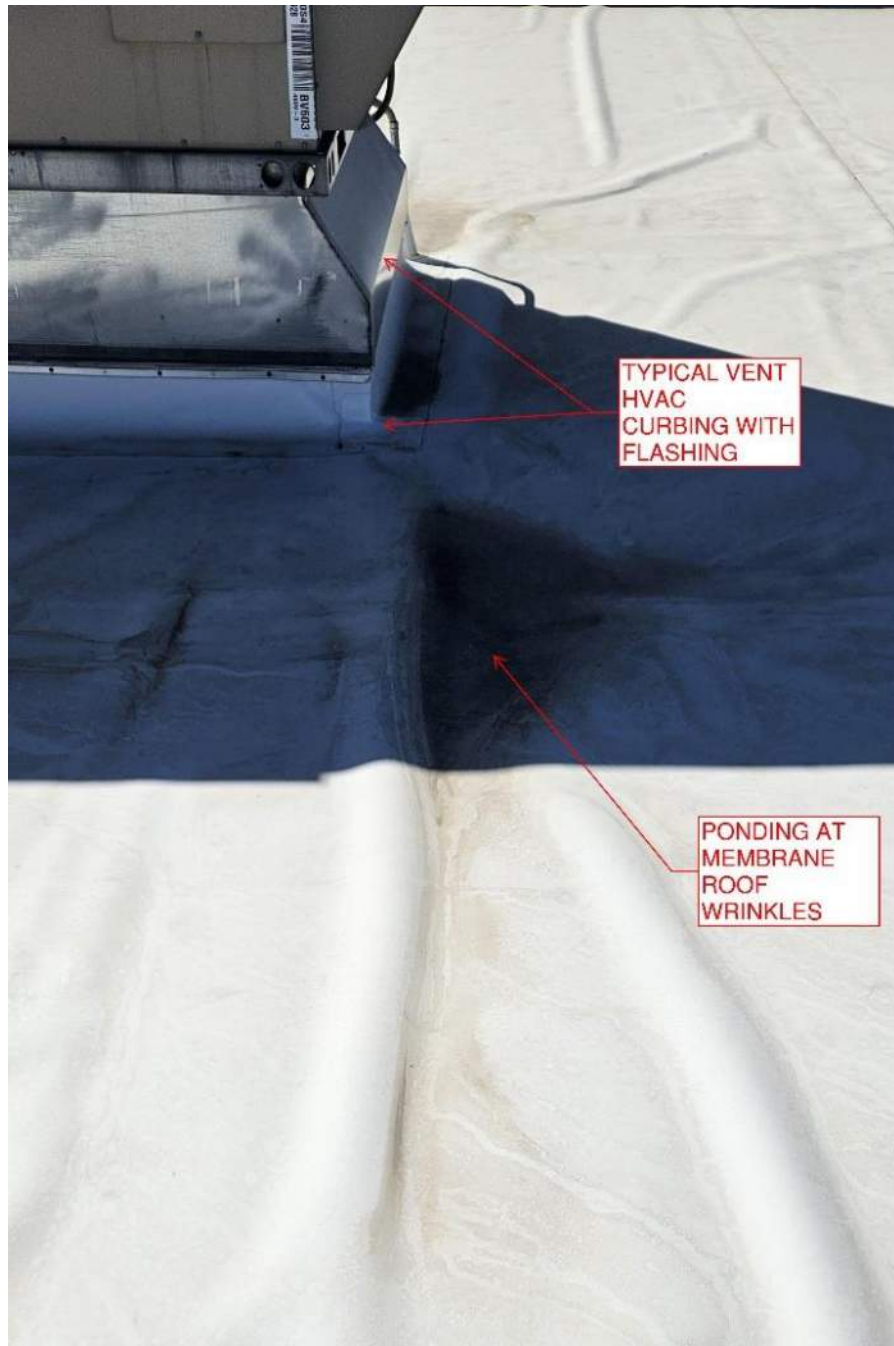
MINOR PONDING ON THE MEMBRANE ROOF
